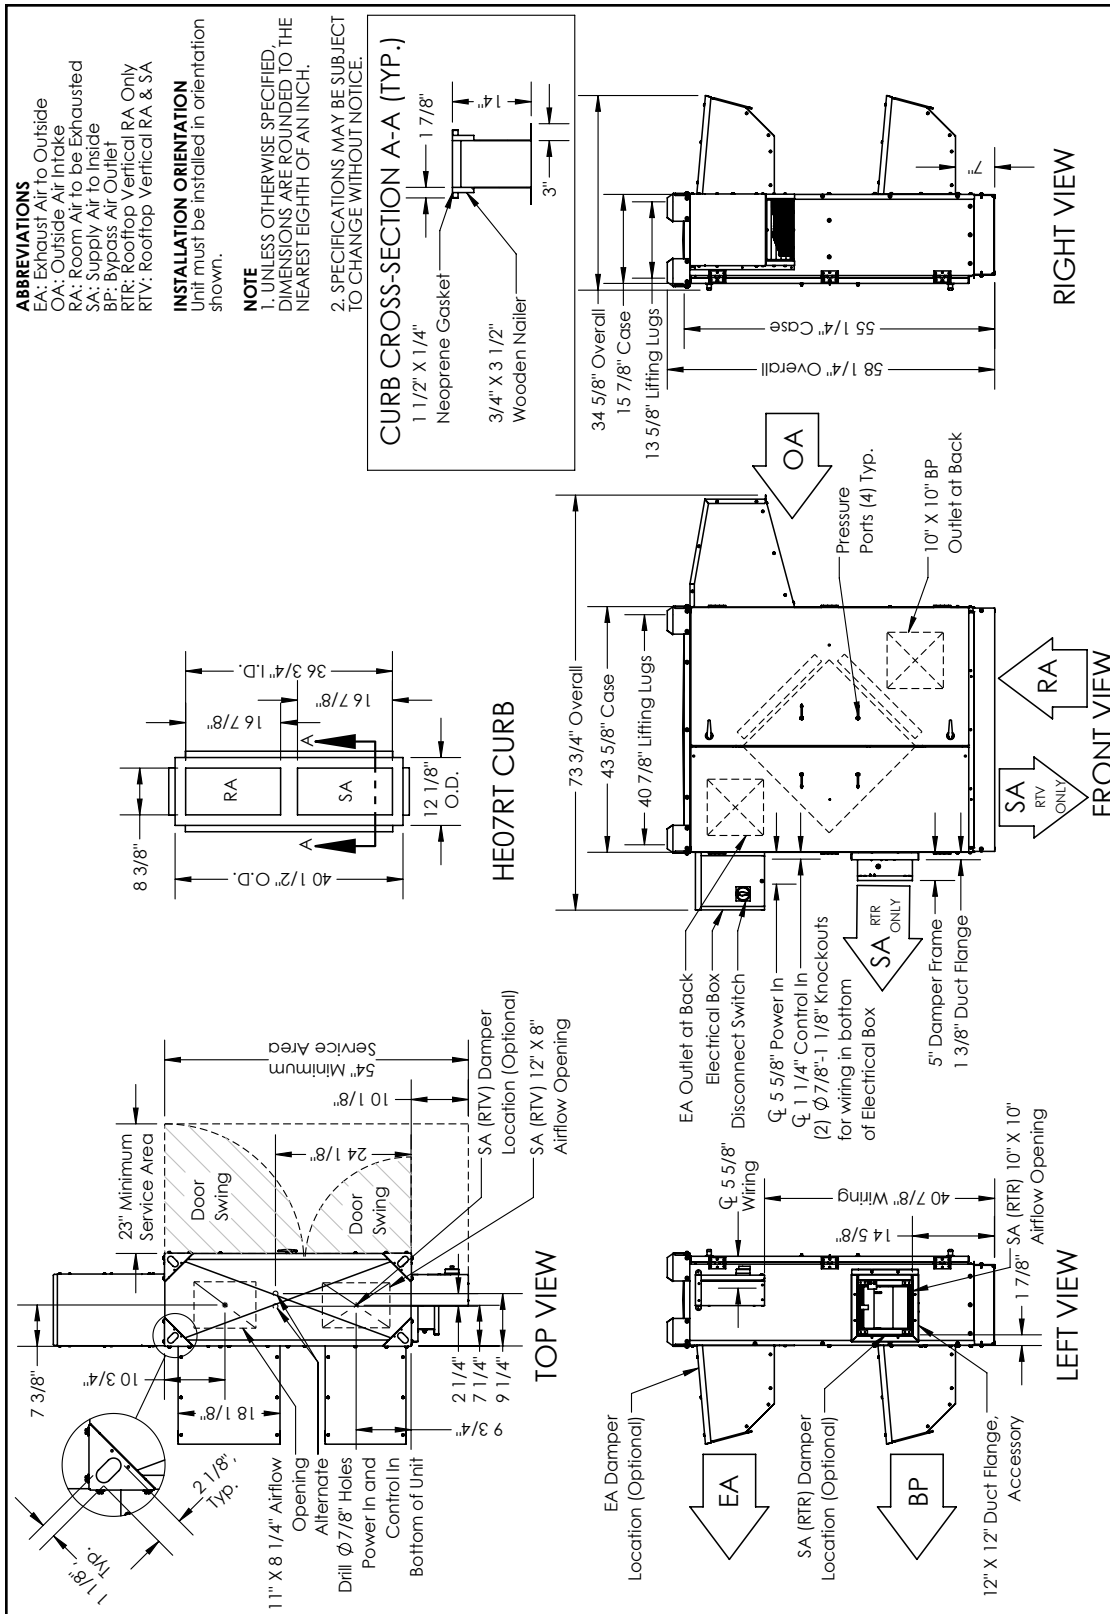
HE07RTR-V DIMENSION DRAWING
